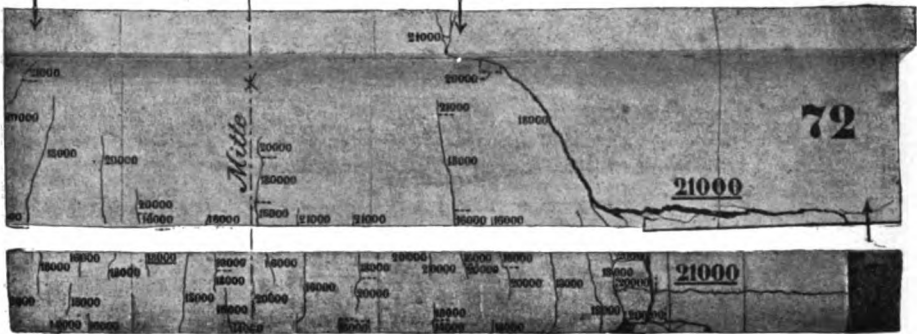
Side view, bottom, and cross-section of a beam of T-section with straight reinforcement without hooks and with stirrups.
